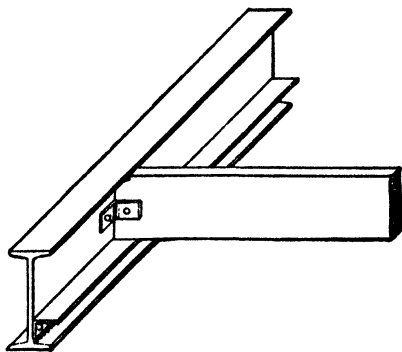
Wooden Beam Framed to I Beam with Shelf-angle
